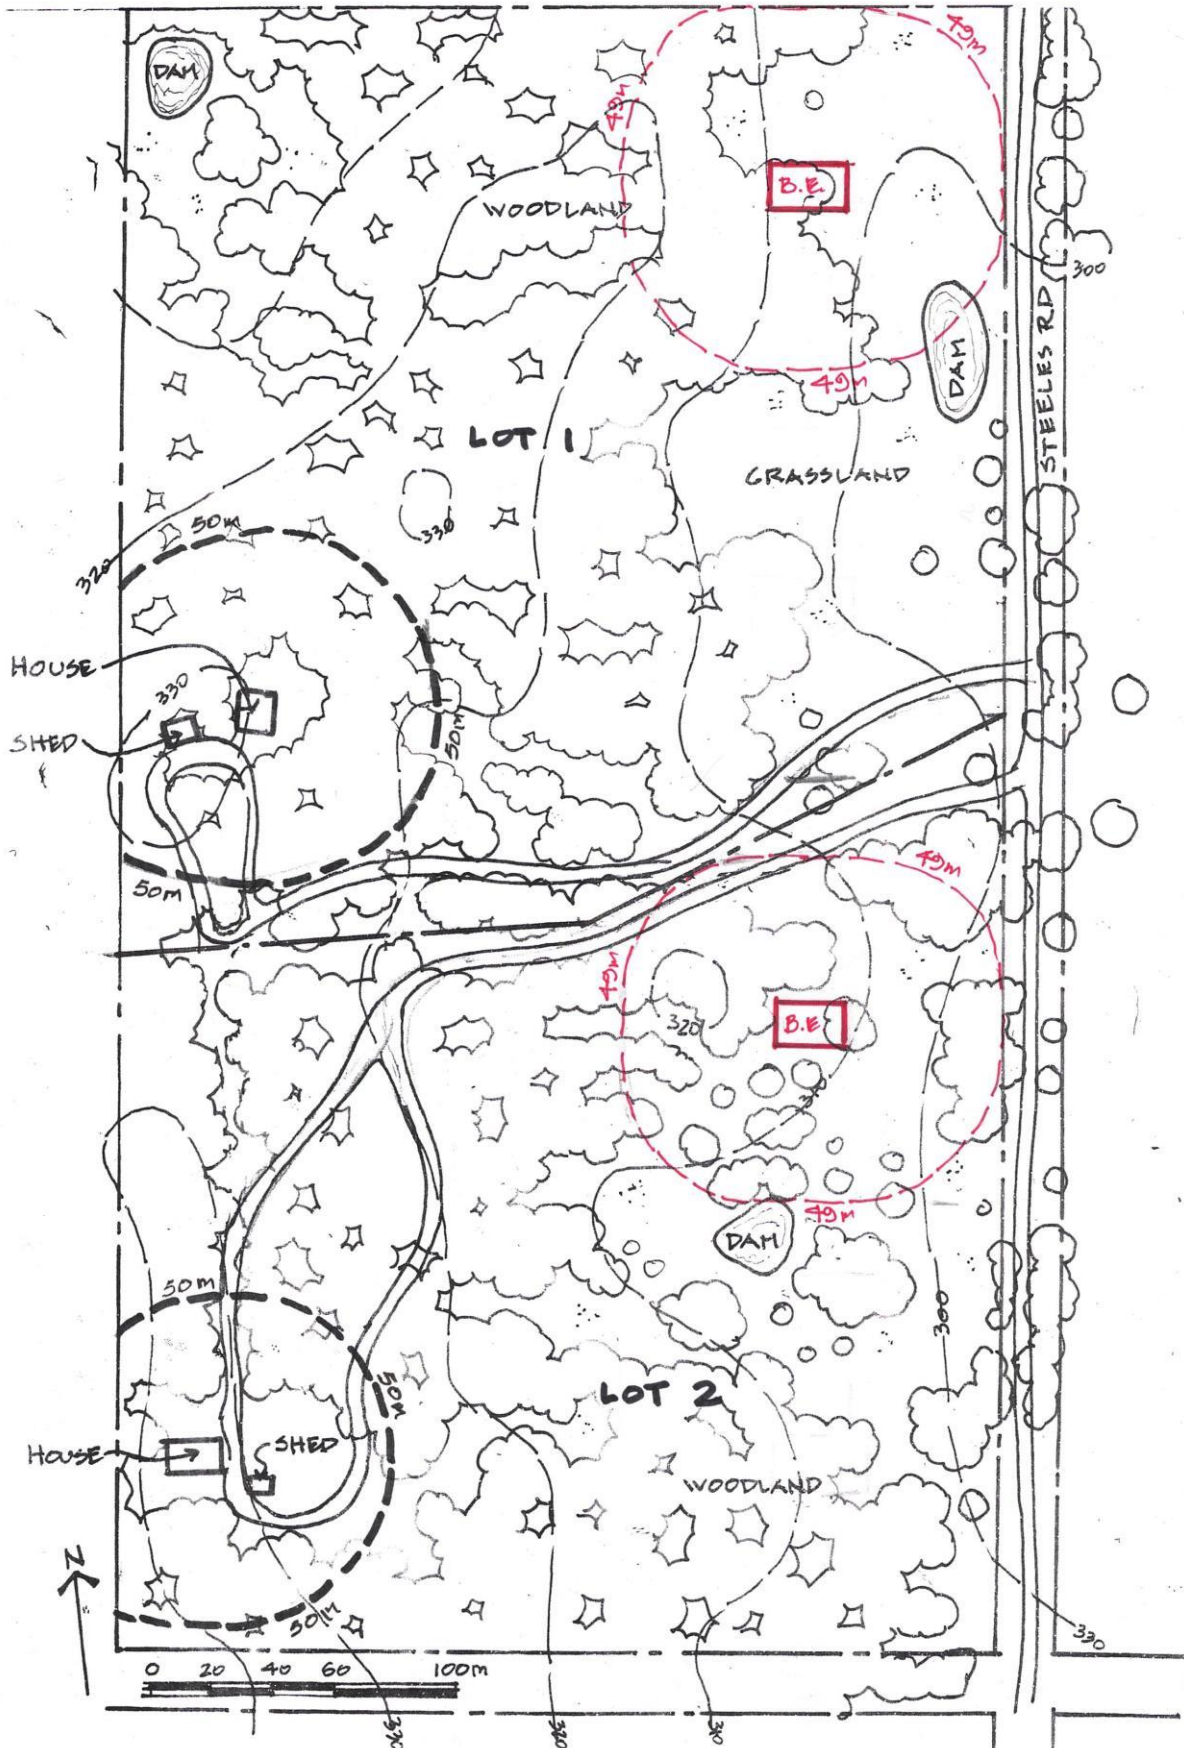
POTENTIAL REPLACEMENT BUILDING ENVELOPES SHOWN IN RED
